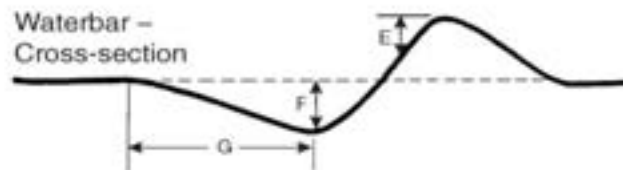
Waterbar construction for forest or ranch roads with little or no traffic. Specifications are average and may be adjusted to conditions.
